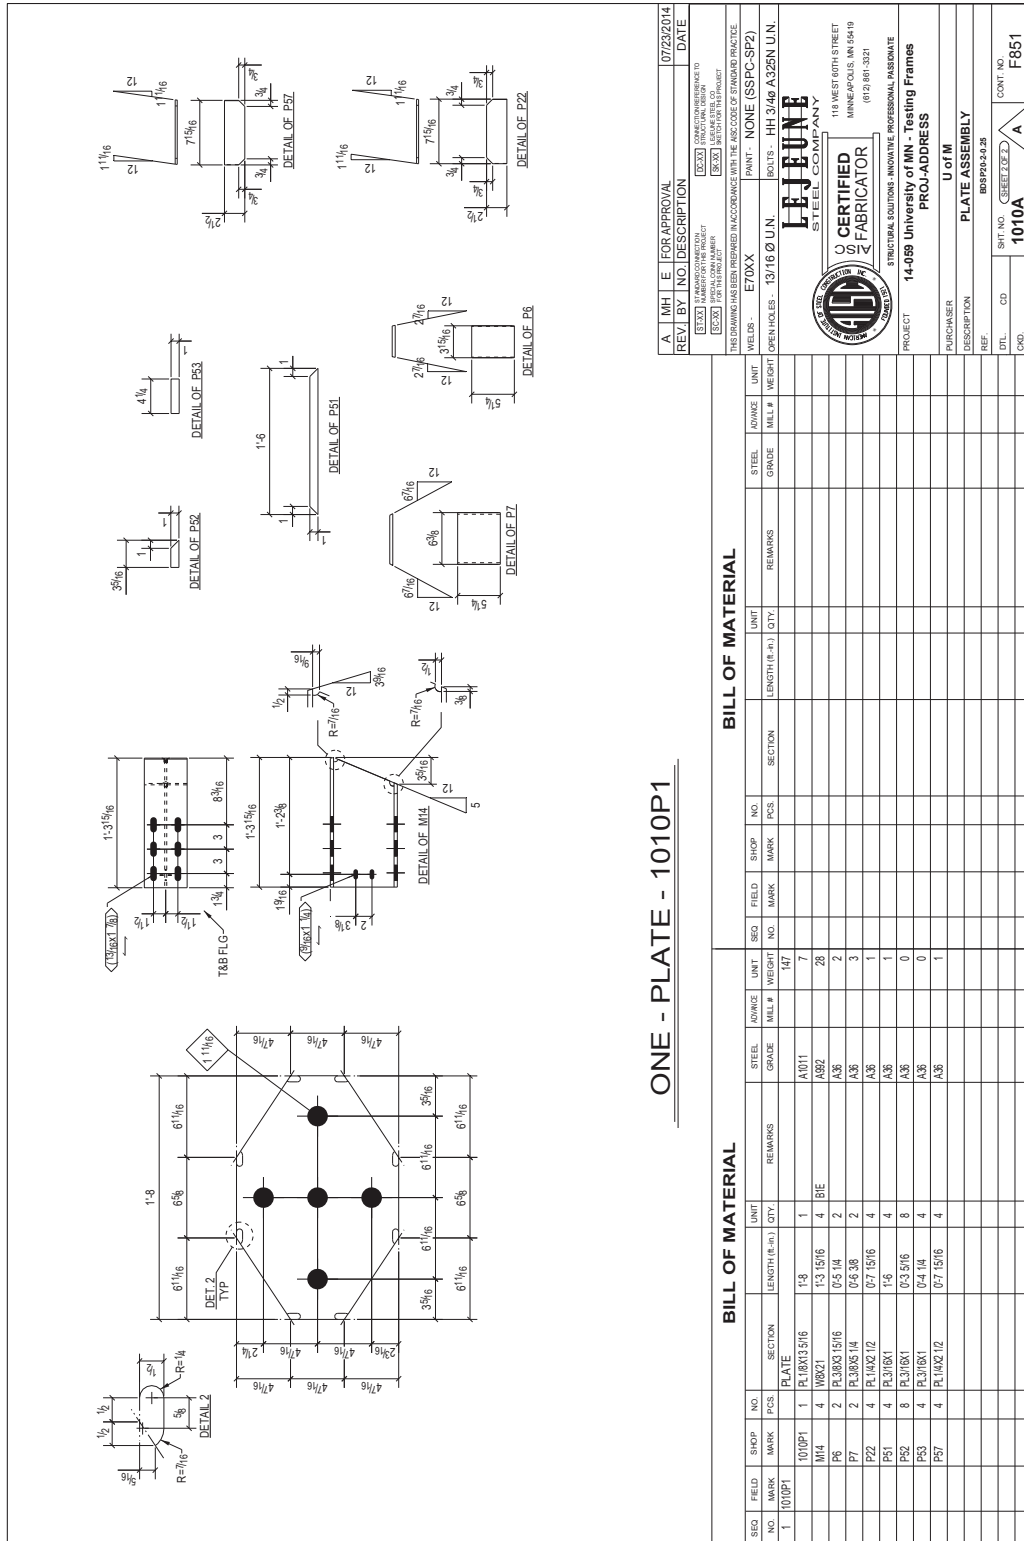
Shop Drawings – Specimen BDSP20-2-25 (1/2)
